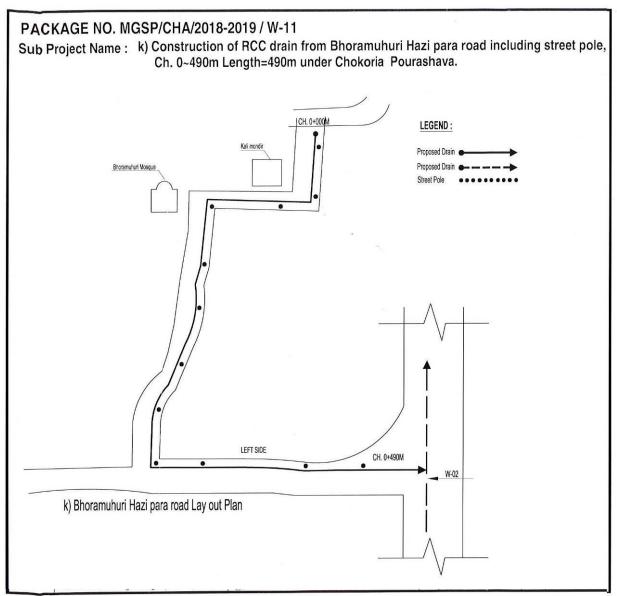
(k): Layout Plan of the proposed Subproject area at Bhoramuhuri Haji Para road
